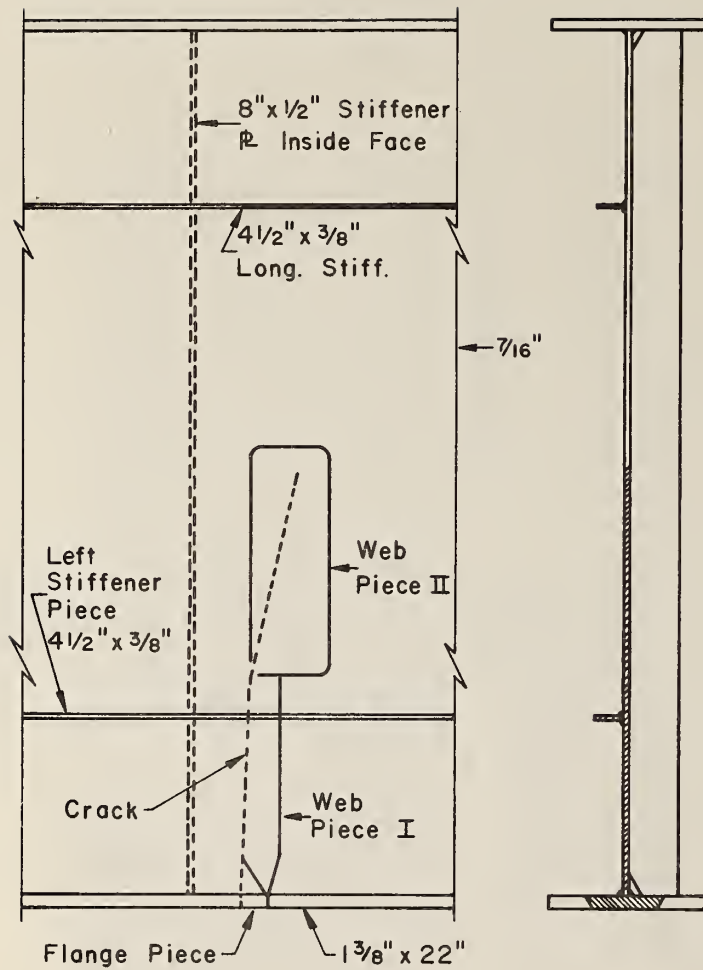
Schematic of girder showing sections removed for examination at crack.
